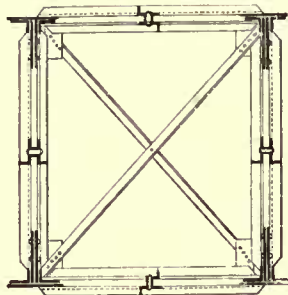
Cross Section of Inclined Ties in Cantilevers.
